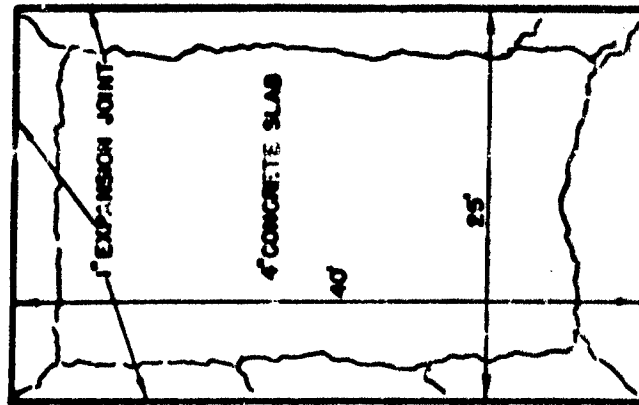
Cracking pattern typical of a tested concrete floor.
